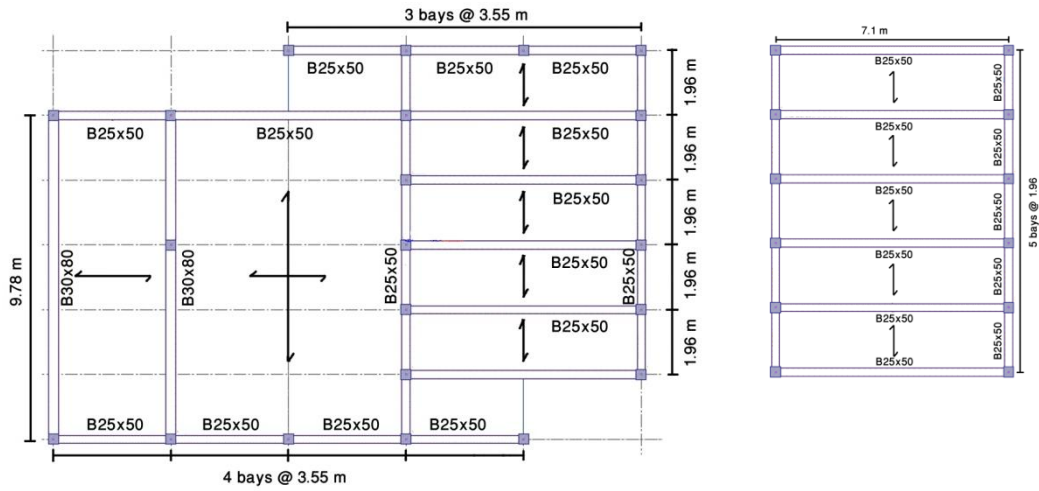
Left: Typical ground floor plan block B1 – Right: Storey plan block B1
